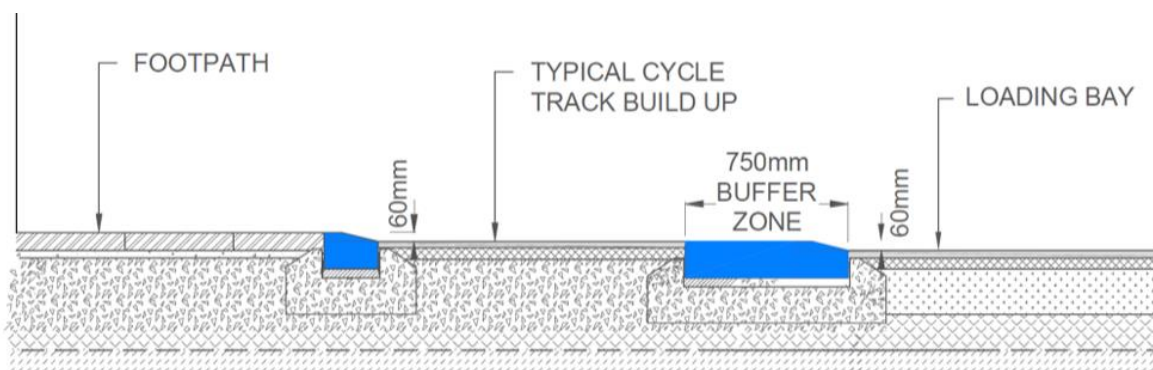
Proposed Loading Bay Cross Section with Chamfered Kerbs
